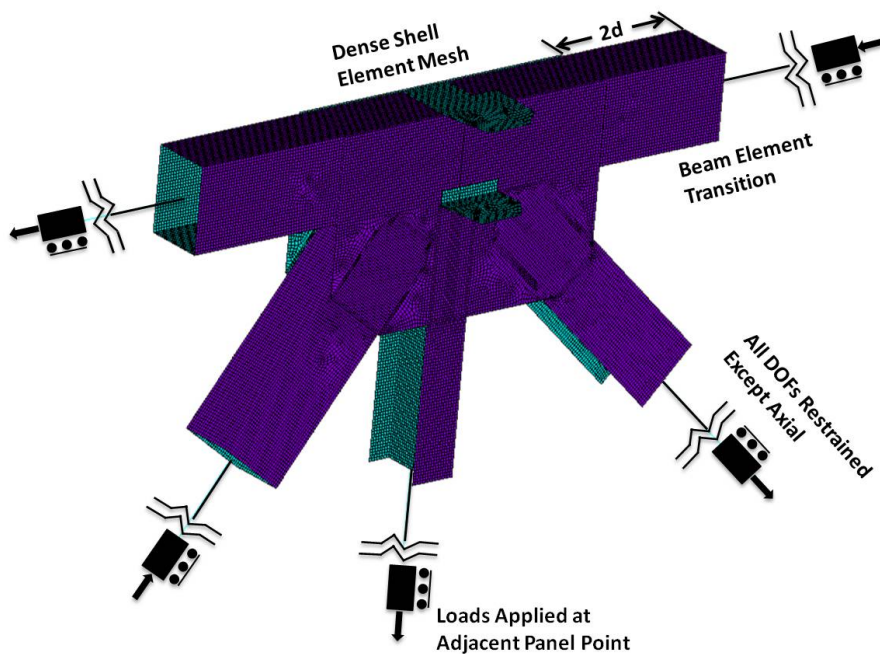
Pilot FE model of Joint U10 gusset plate connection
